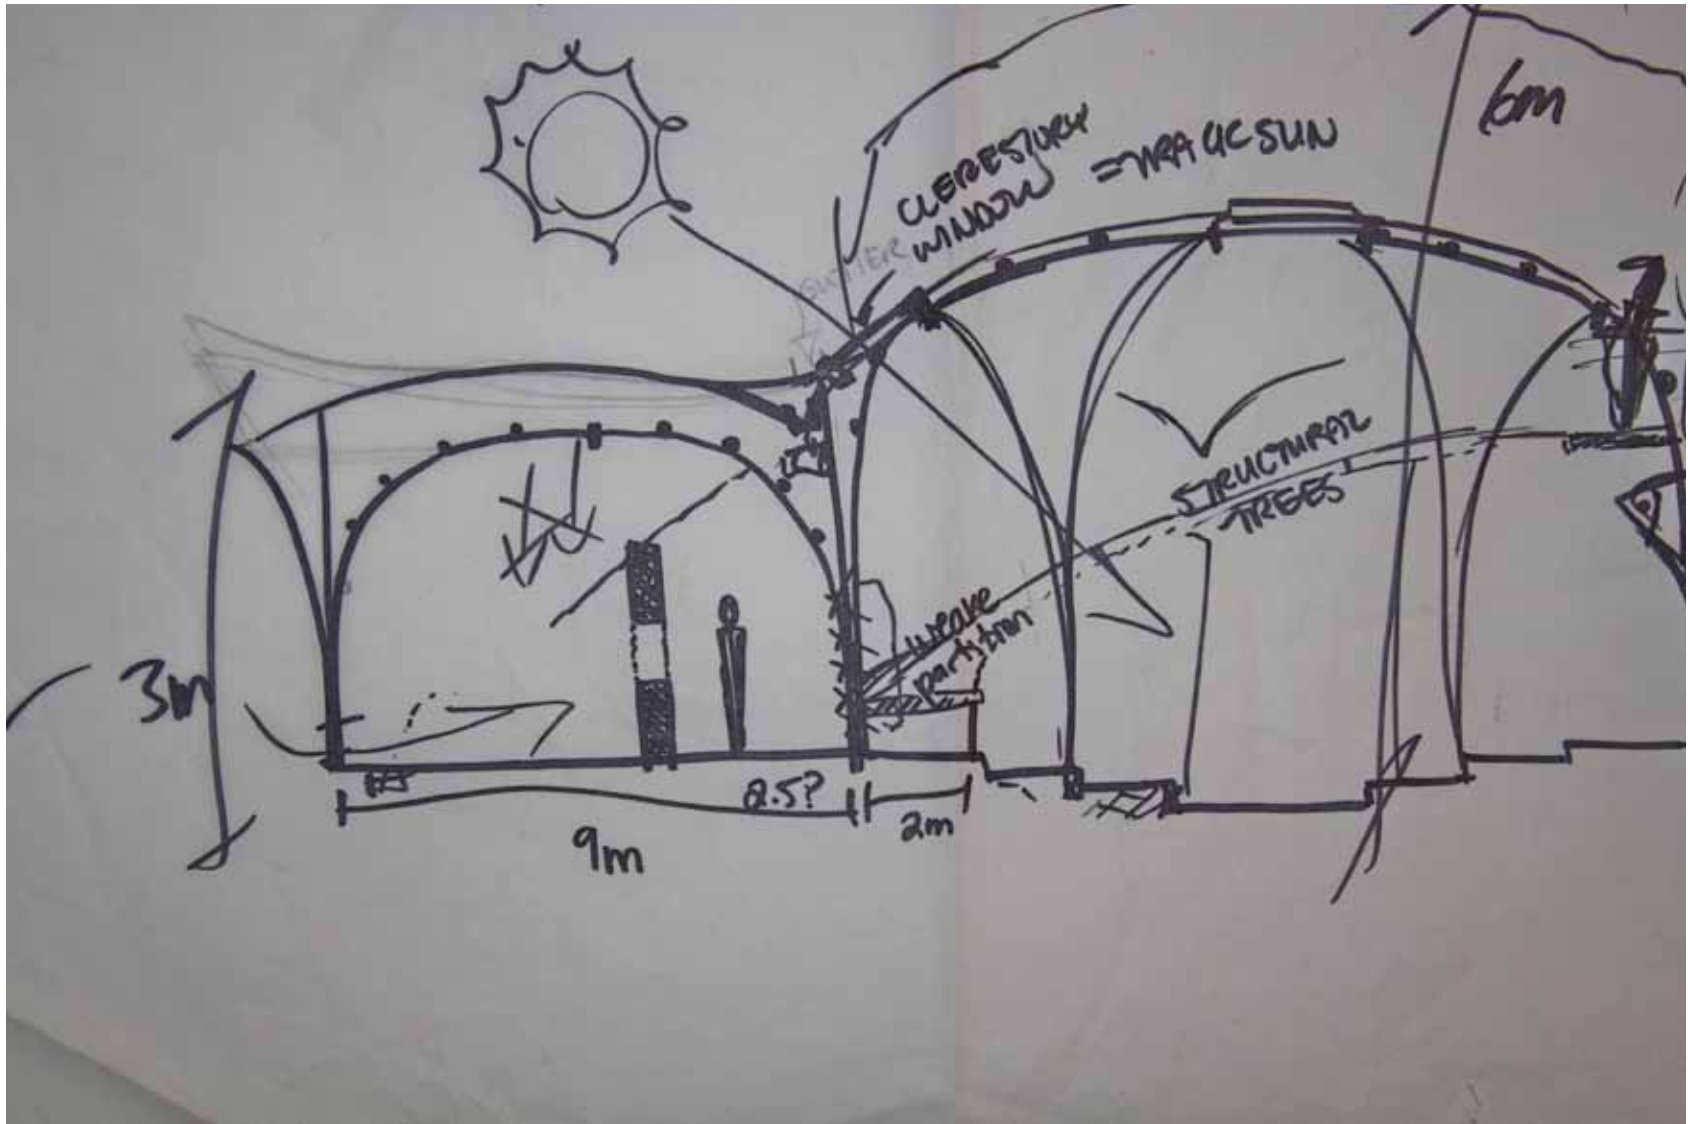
Section based on third plan showing ramp through gathering space
